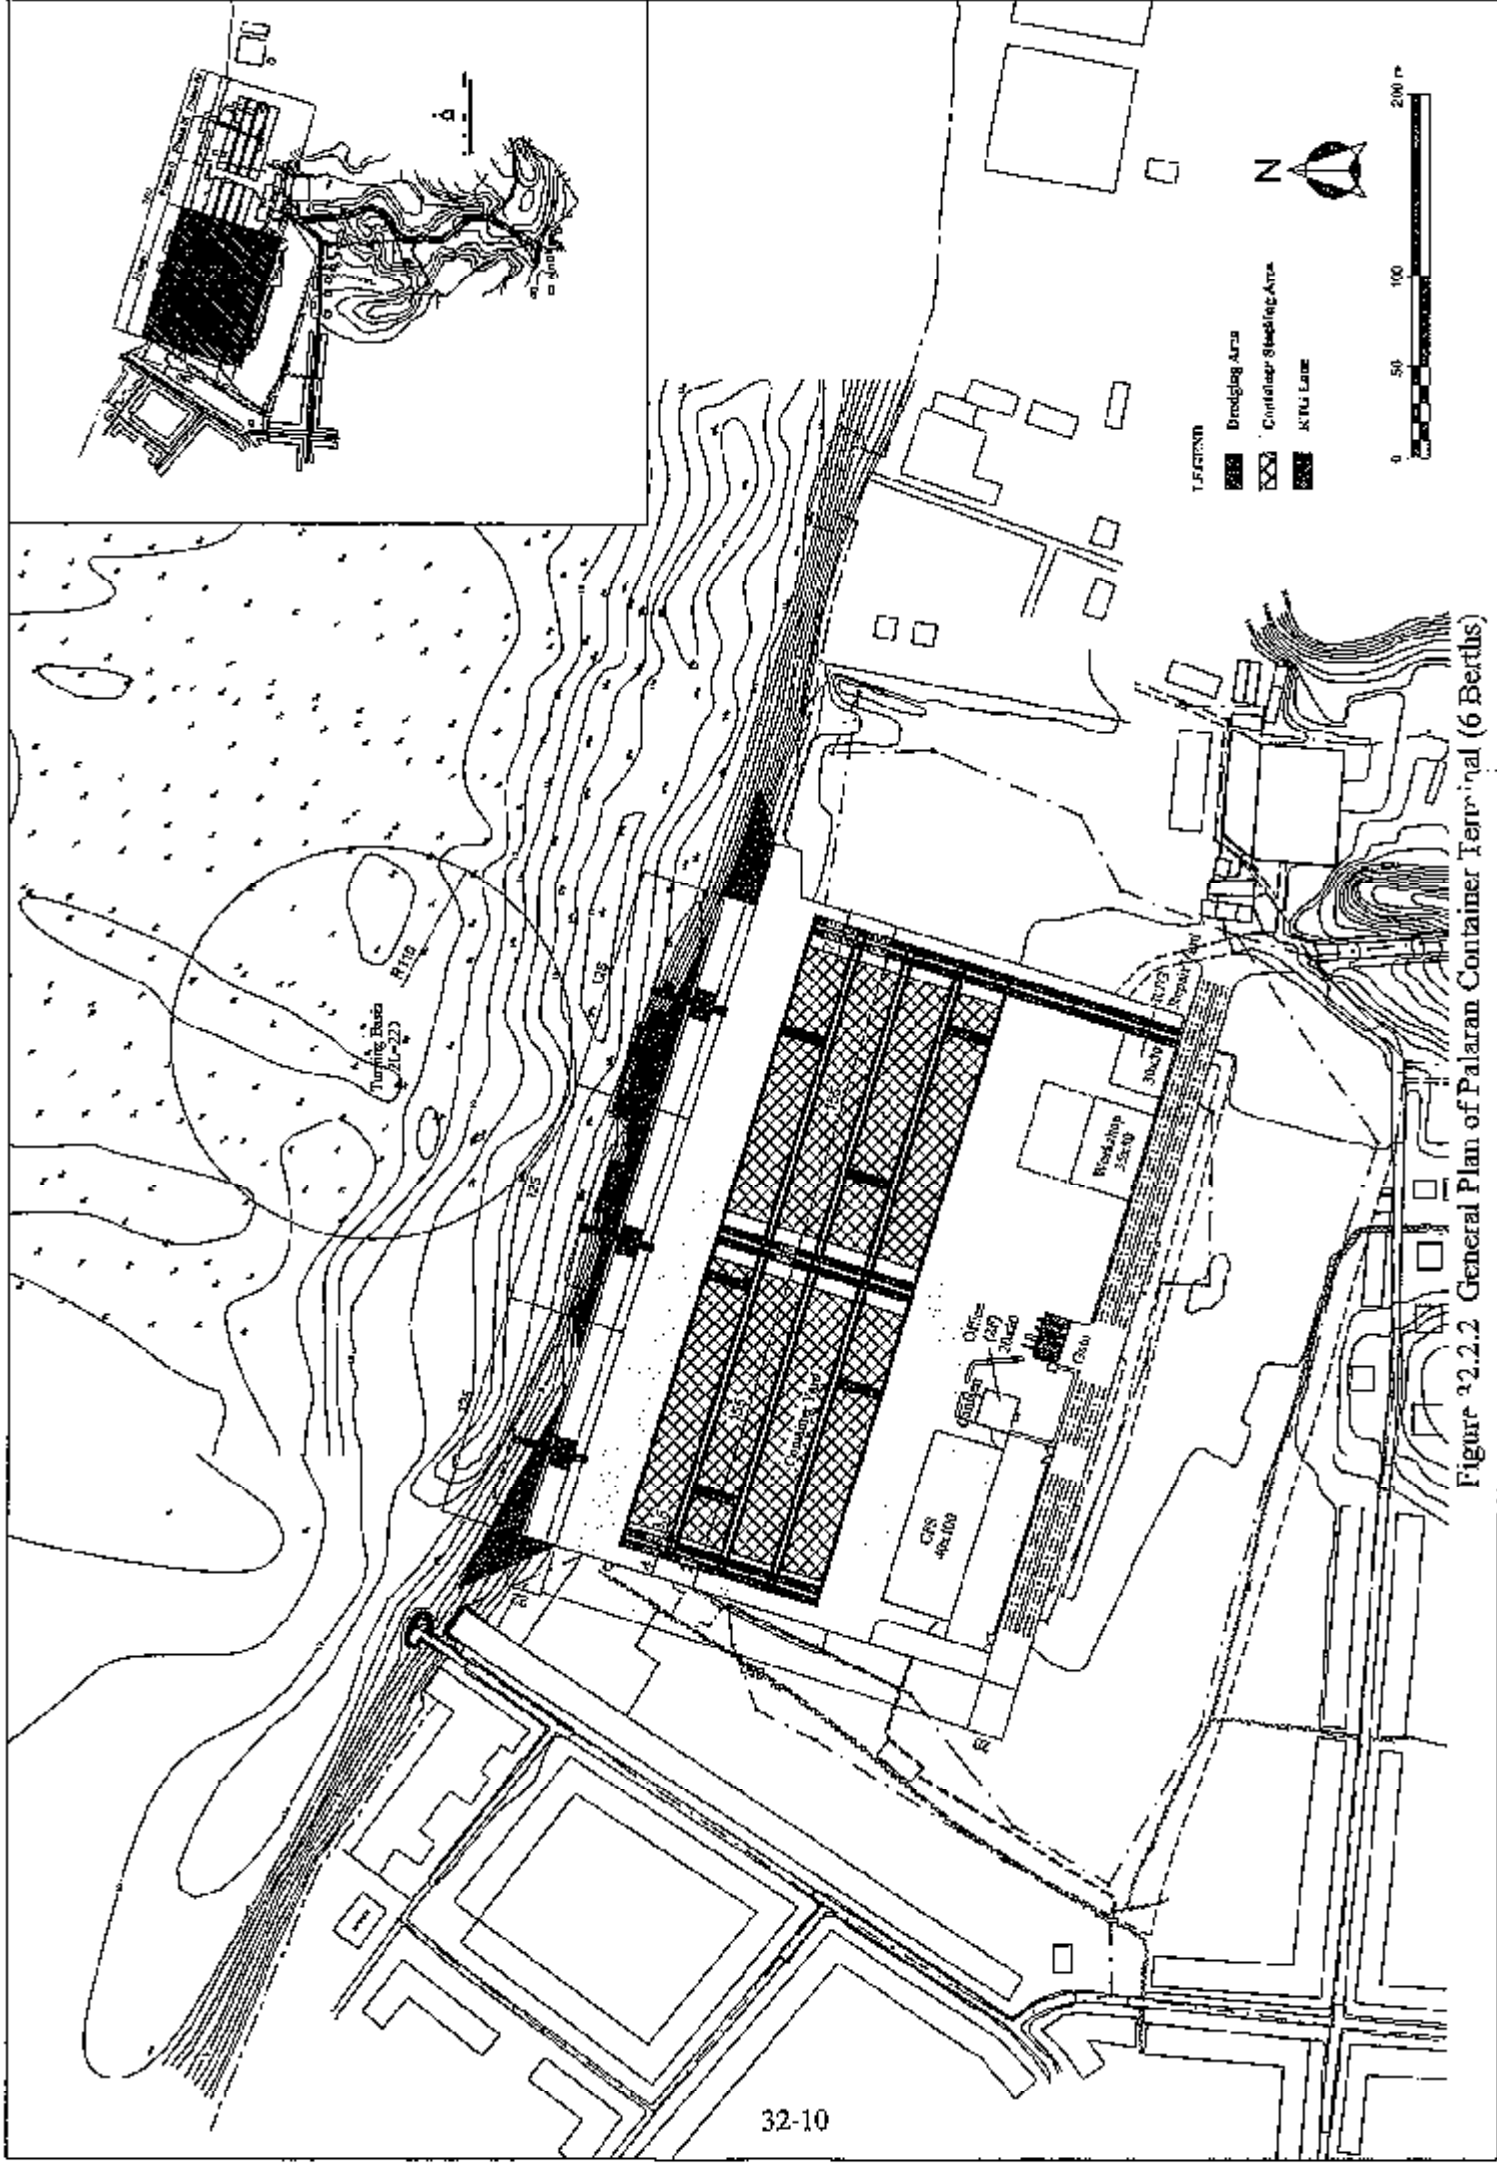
General Plan of Palaran Container Terminal (6 Berths)
